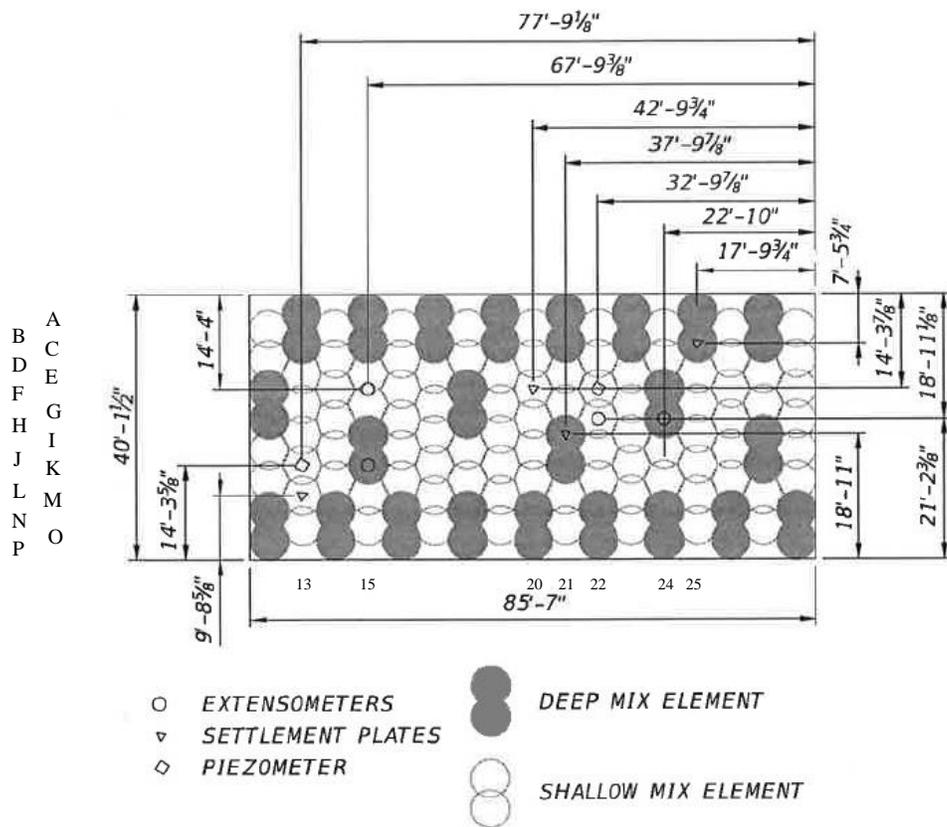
Plan view of surcharge test area (FGE, 2014).
